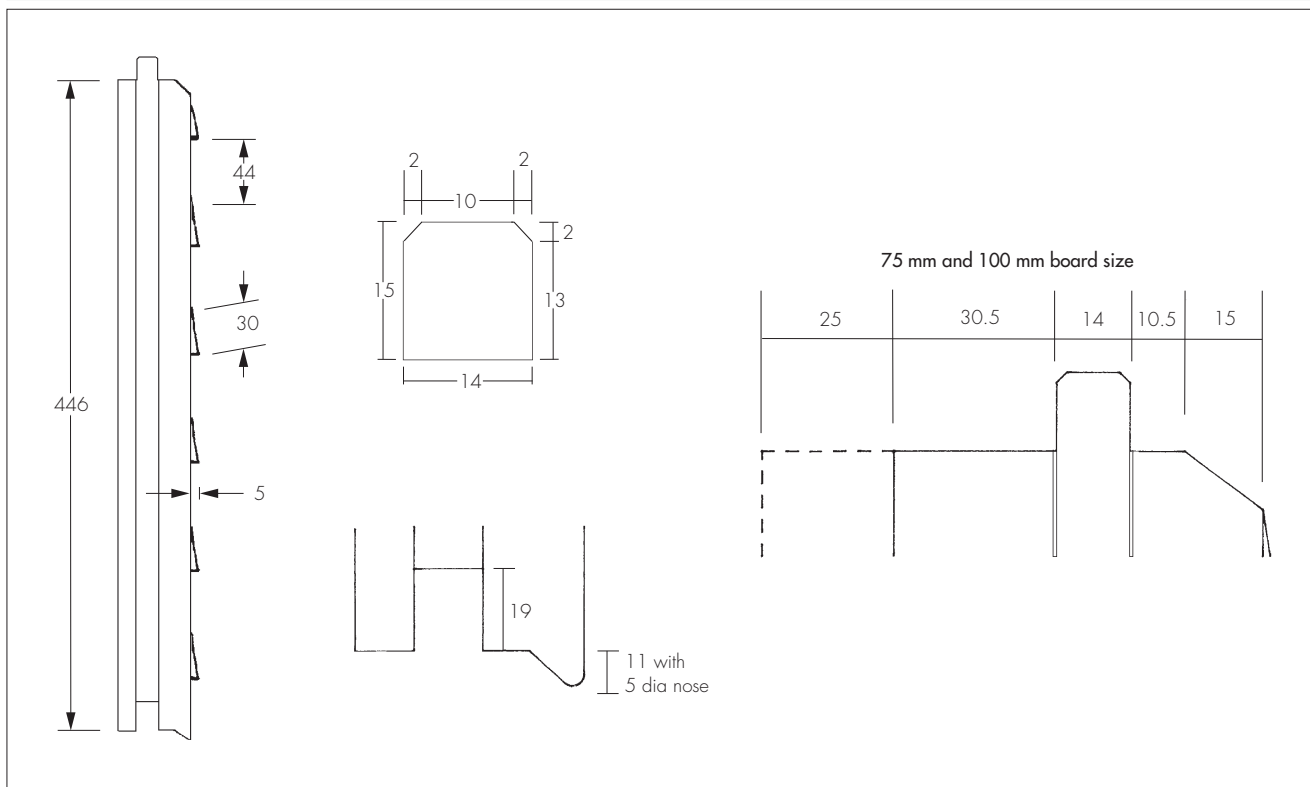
Jabfill Premium panel — side elevation (all dimensions in mm)
